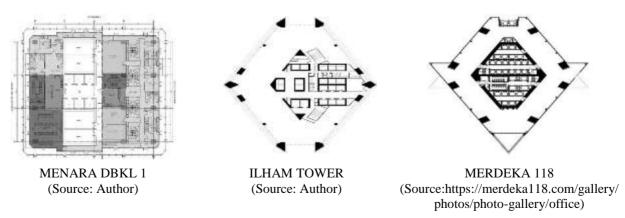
Renovation plan in Menara DBKL 1 and column less layout in Ilham Tower and PNB Merdeka 118. (Source: Author)
